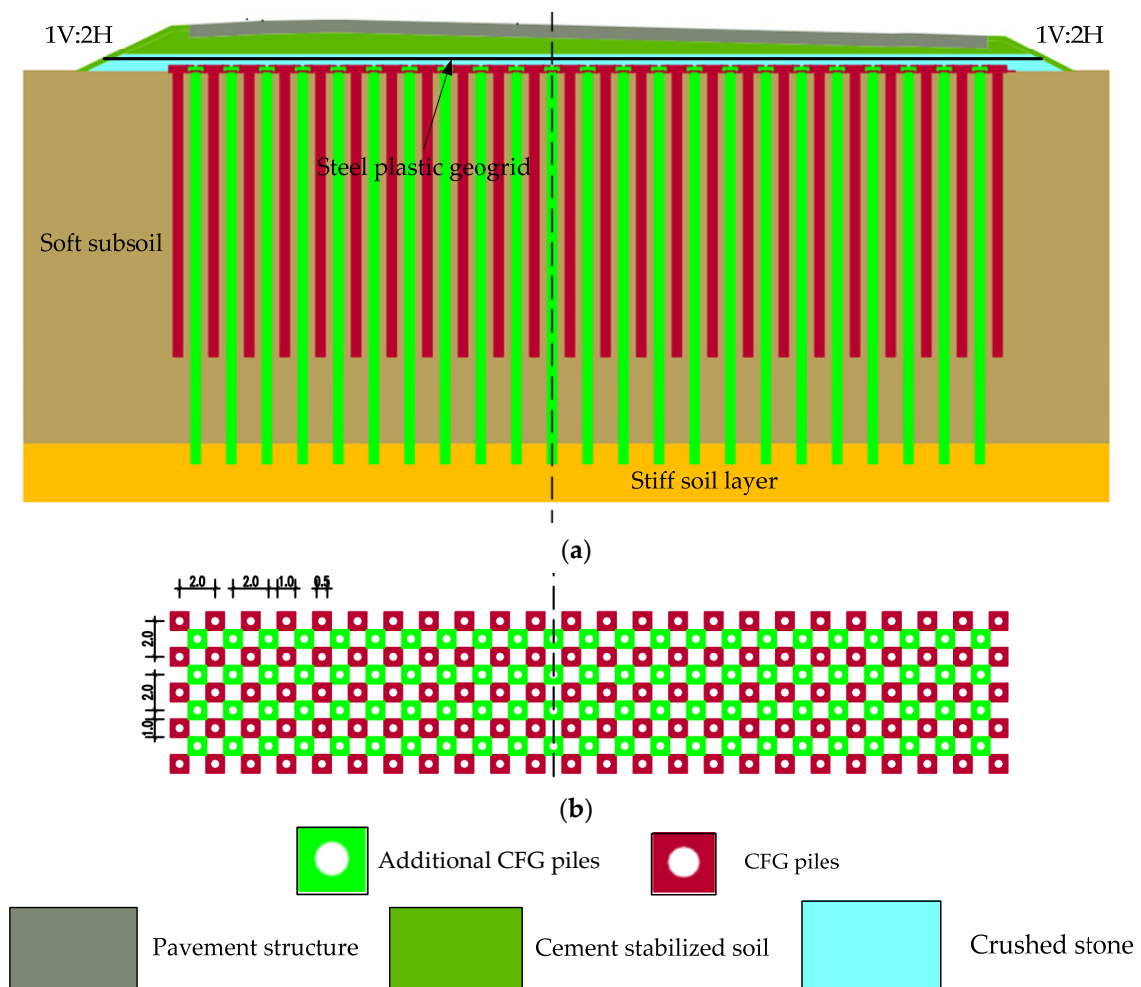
Reinforcement diagram of pile-net composite foundation embankment in CFG test section: (a) Cross section. (b) Pile location layout.
